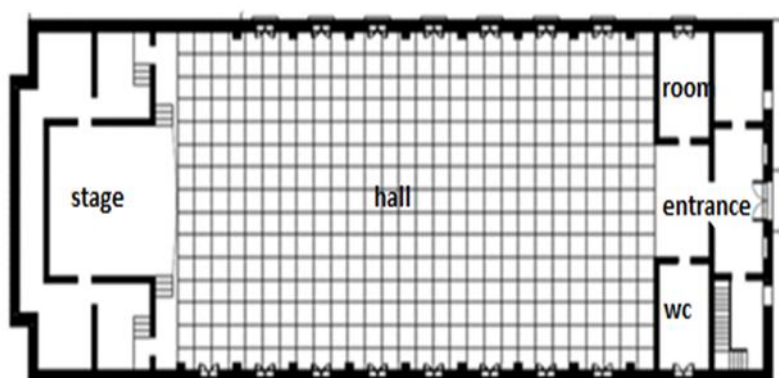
Van Ernis Village Institute Multi-Purpose Hall plan
